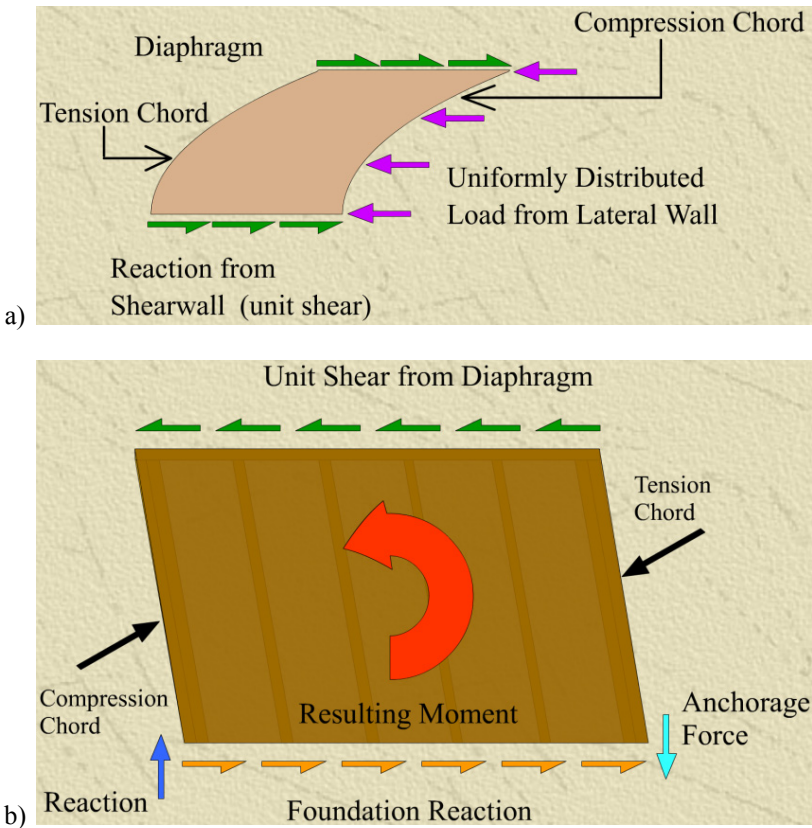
Structural scheme of floor a) and walls b) diaphragms (<http://timber.ce.wsu.edu/Supplements/ShearWall/Loadpath.htm>)
